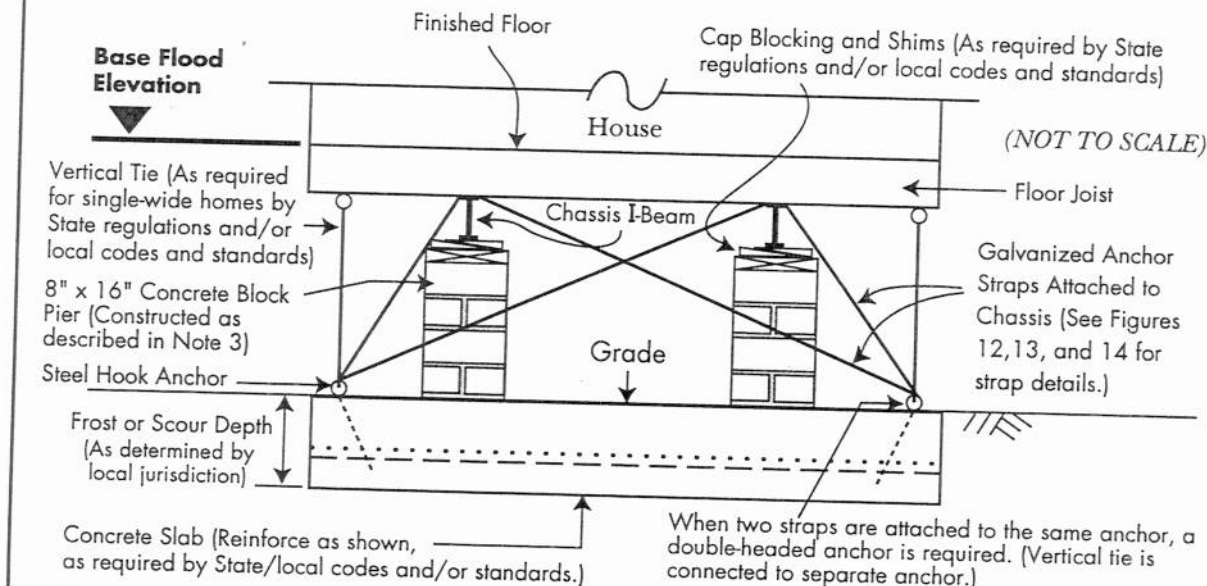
Concrete block piers on concrete slab, with steel hook anchors. (Single-wide home.)
